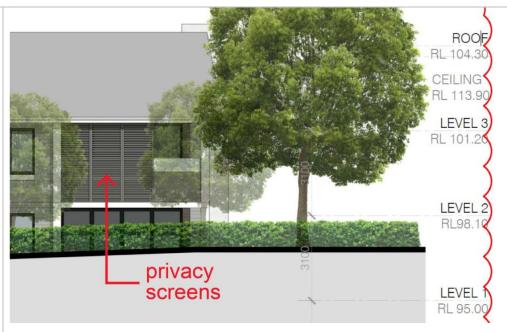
Extract from architectural plans detailing privacy screening to Block C where the contravention occurs and no windows in roof. (Source: Hyecorp)
